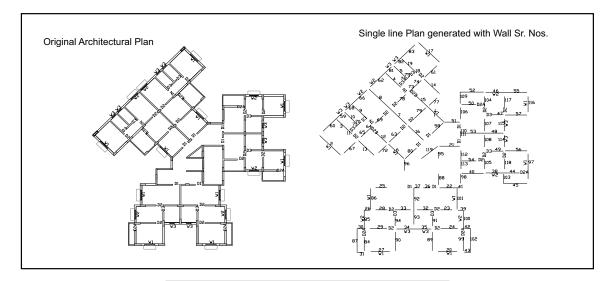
Single Line Plan with Wall, Doors and Windows
